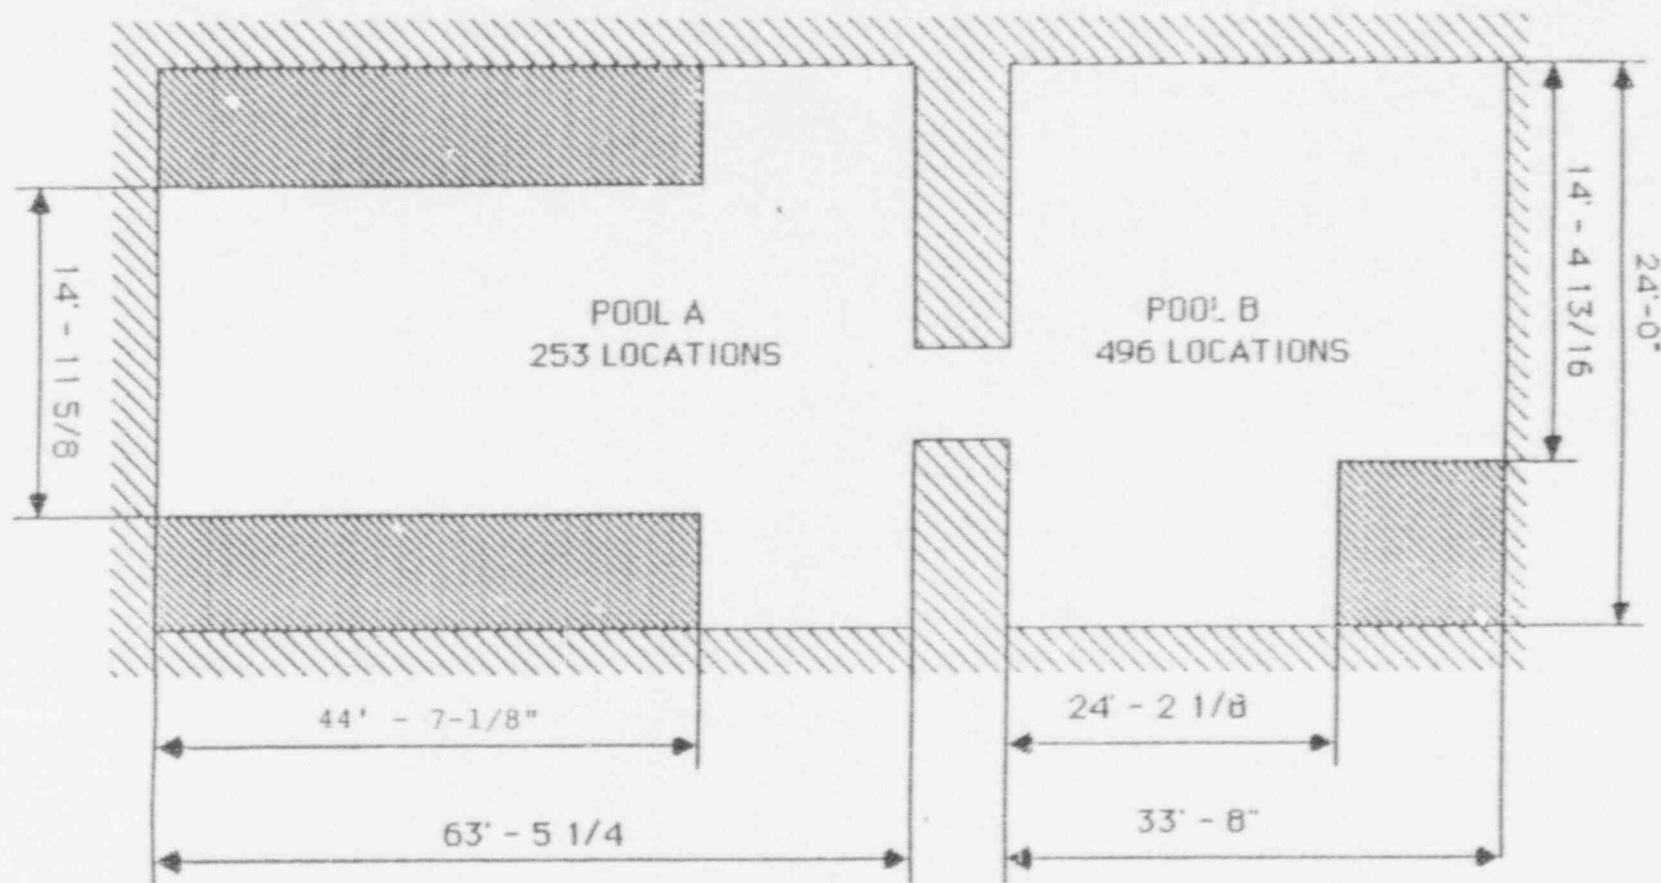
PLAN VIEW OF TMI-1 POOL SYSTEM
